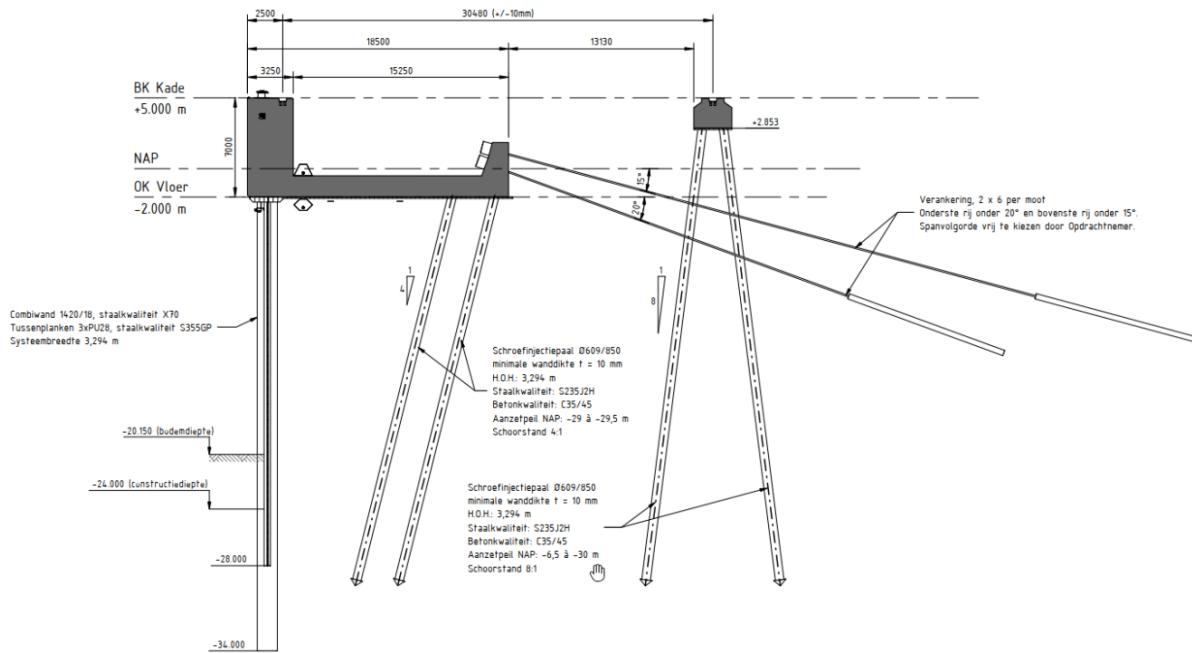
Structural layout and key components of the quay wall under study.[23]
